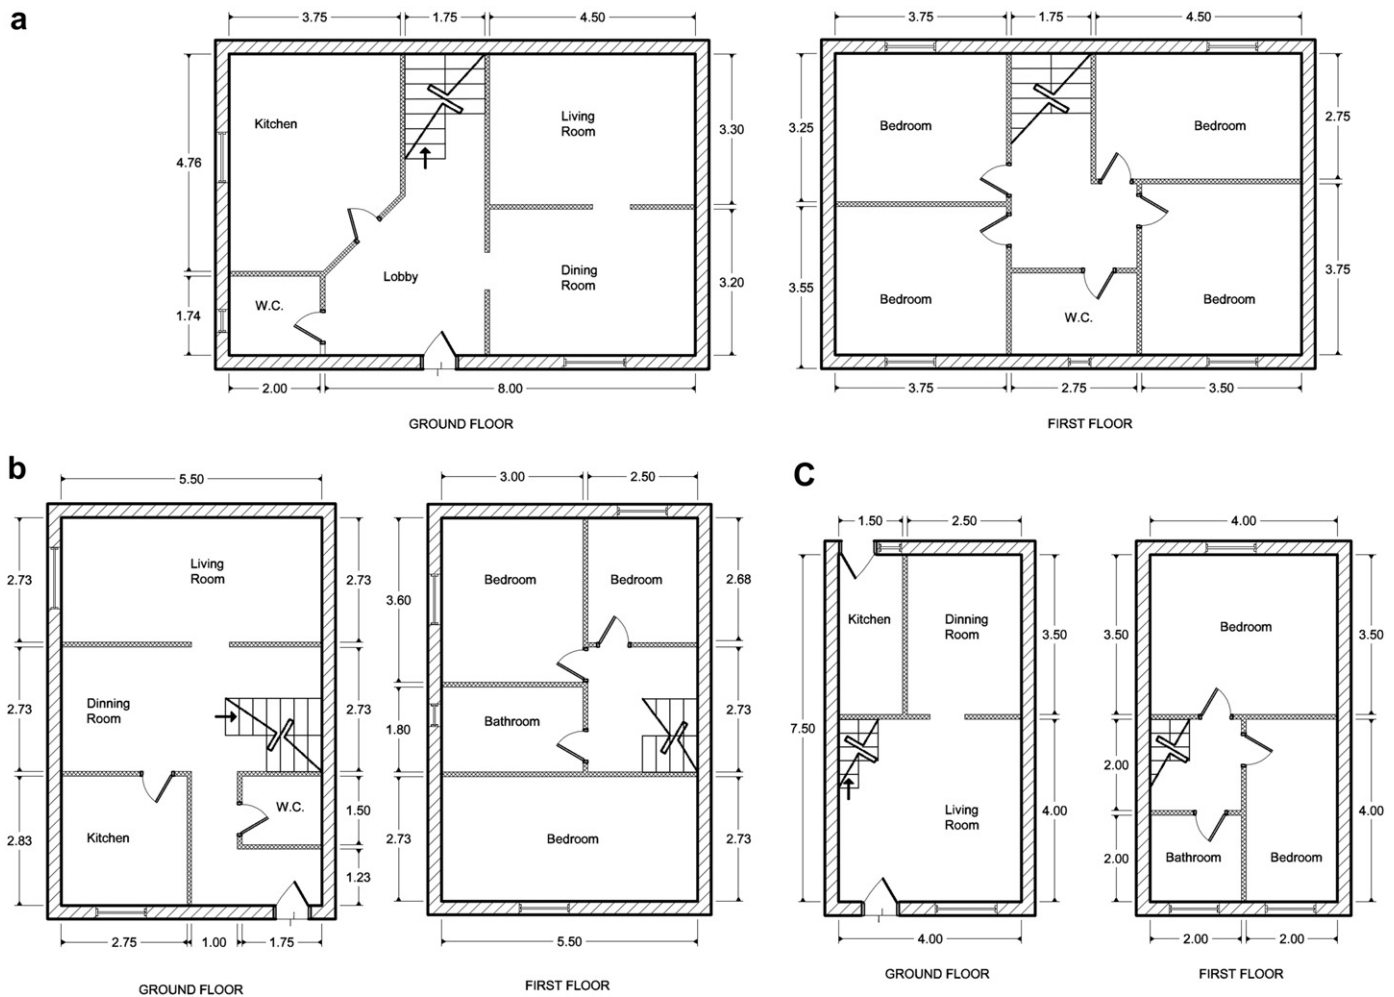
Floor plans for the houses under study: (a) detached (b) semi-detached (c) terraced house.
